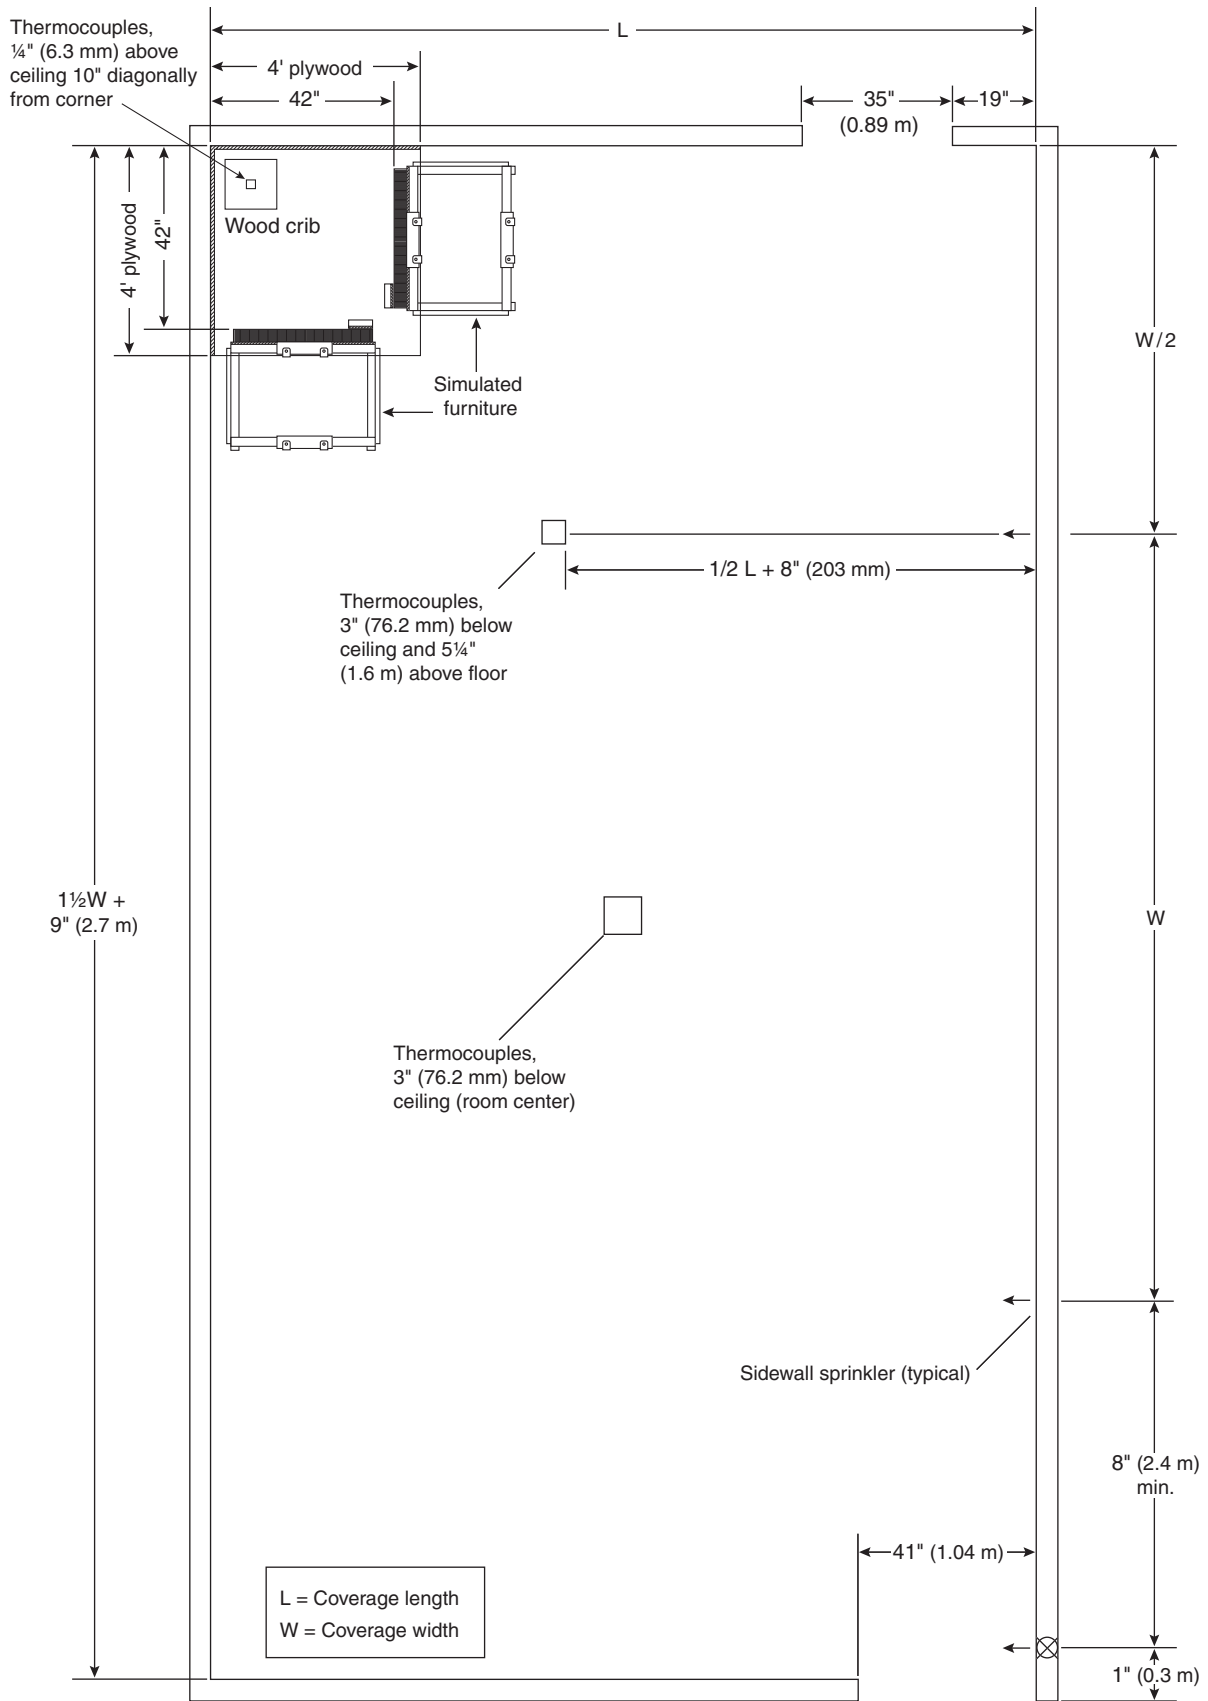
Fire Test Arrangement from UL 1626 for Sidewall Sprinklers, Test Arrangement 1
